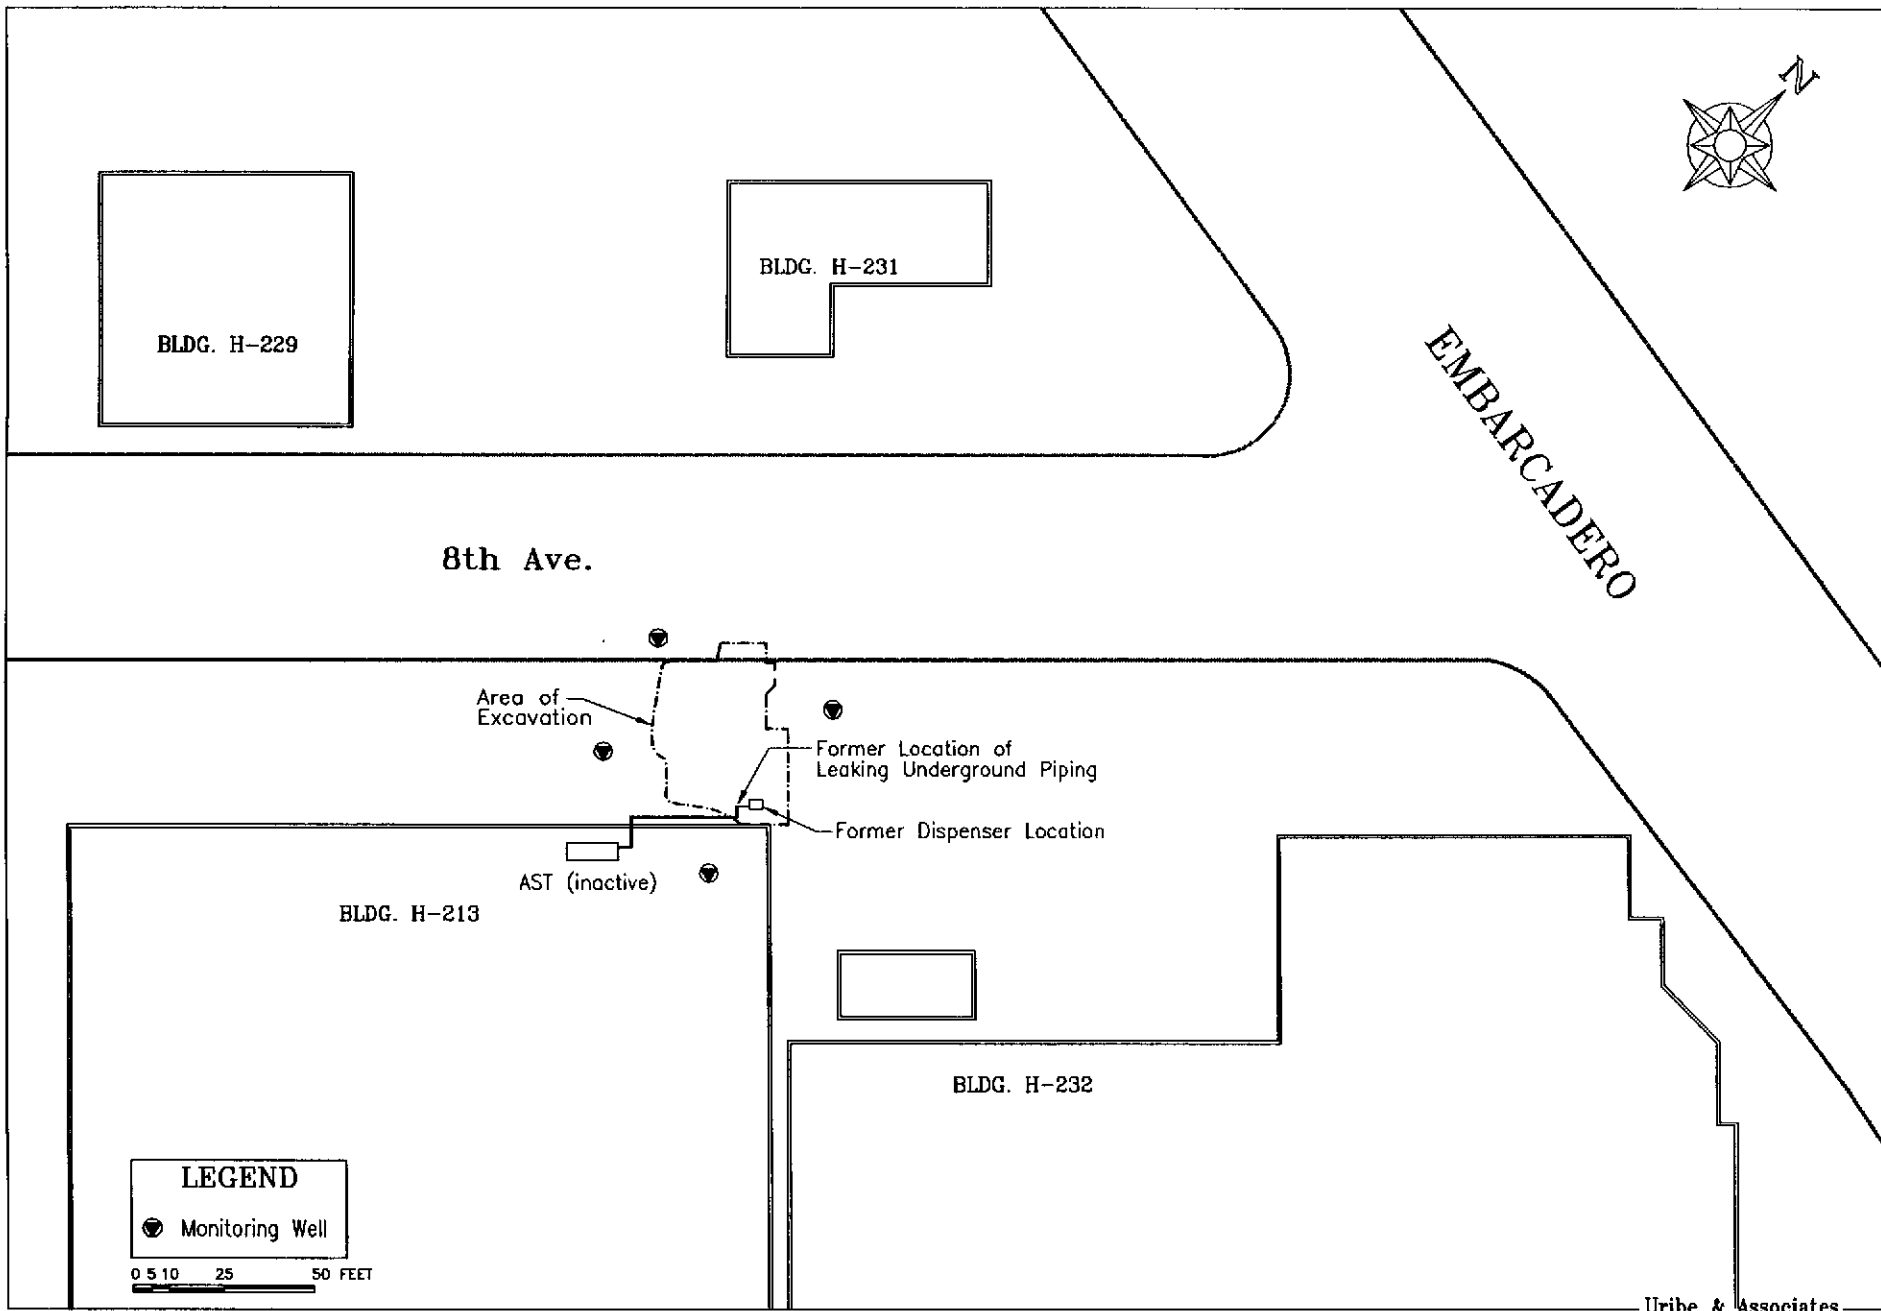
Site Plan, Showing Proposed Monitoring Well Locations
